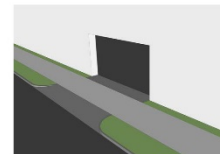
On-street carous should be limited to 2 per block face on A streets and should be limited to no more than 24' wide.
